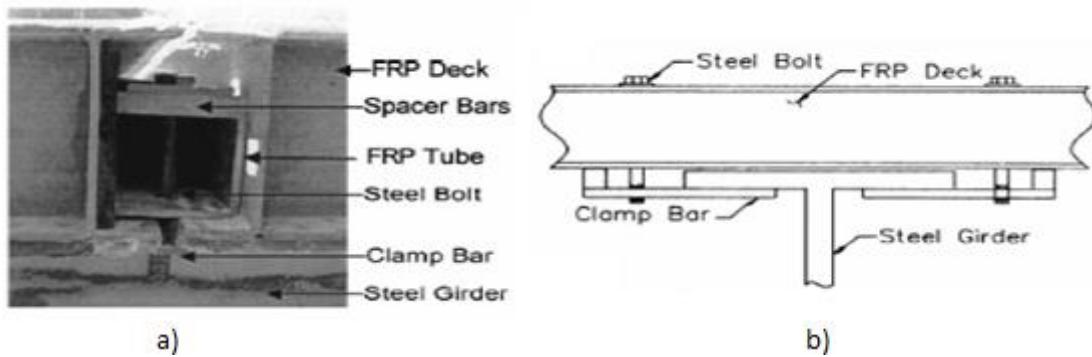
Clamped connection a) elevation view b) the cross section (Liu 2007)
